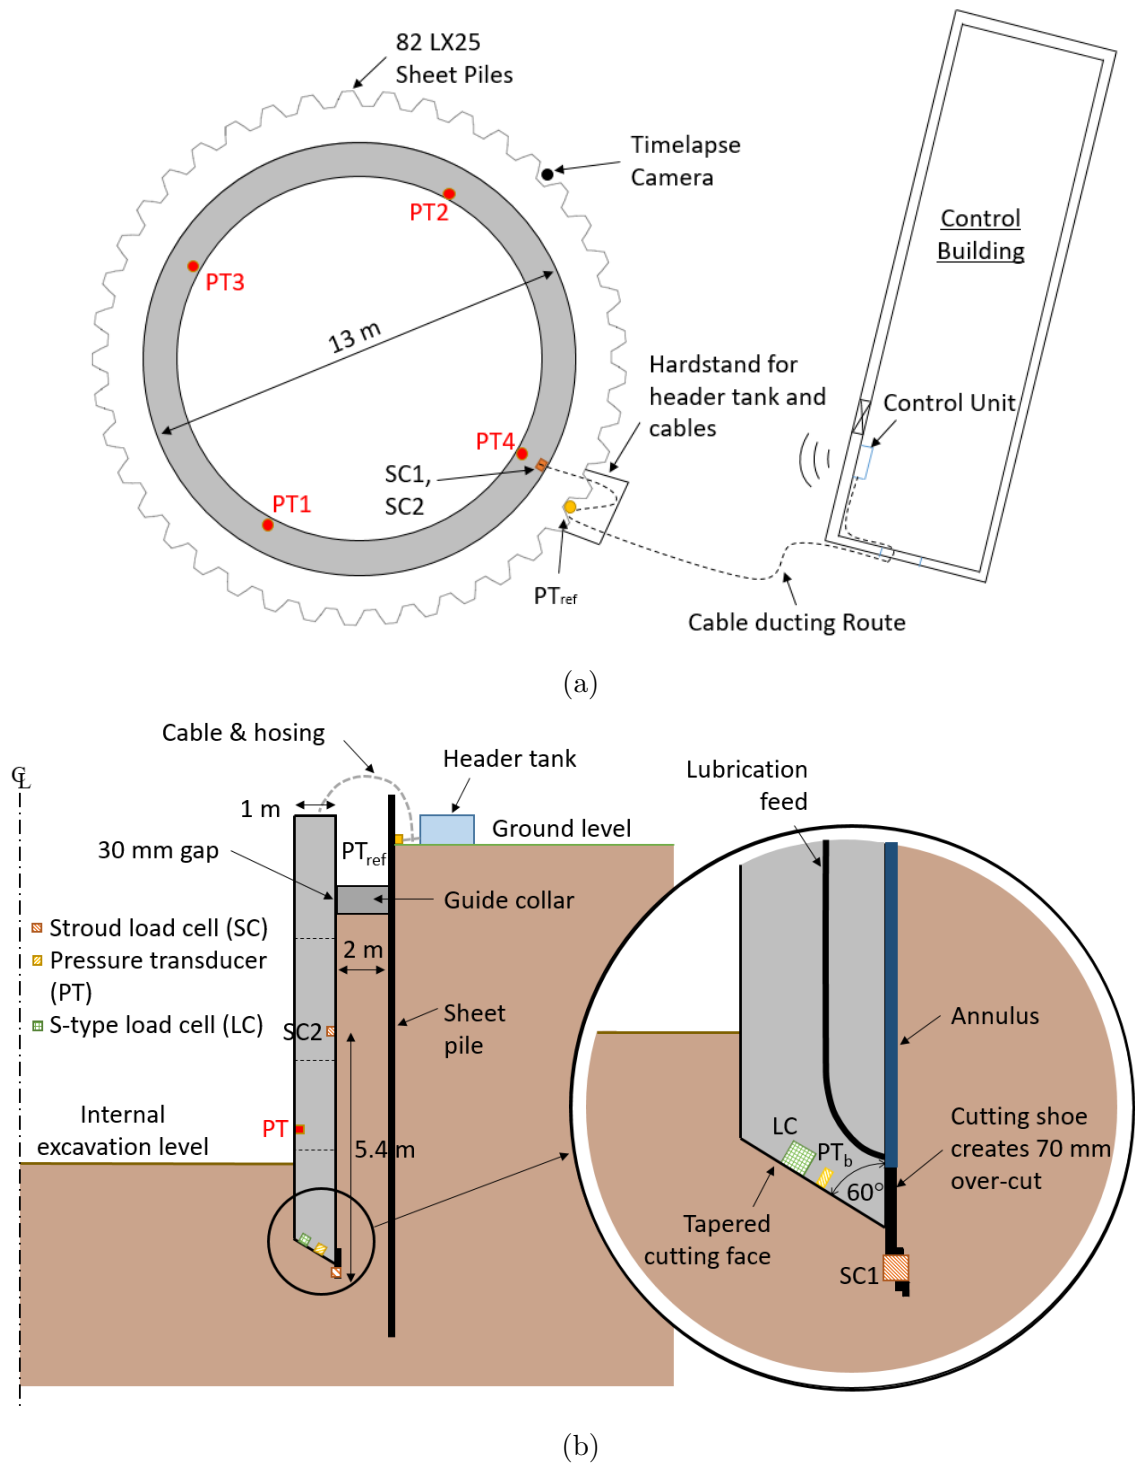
(a) Plan view of Sloway Lane site, (b) Section through caisson showing locations of instrumentation.
